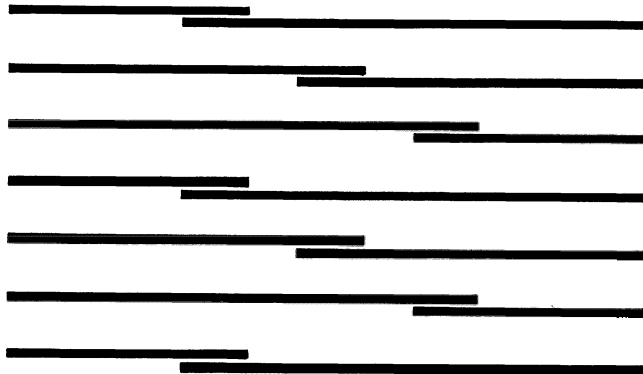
Recommended arrangement for the splicing of reinforcing in slabs on ground.
